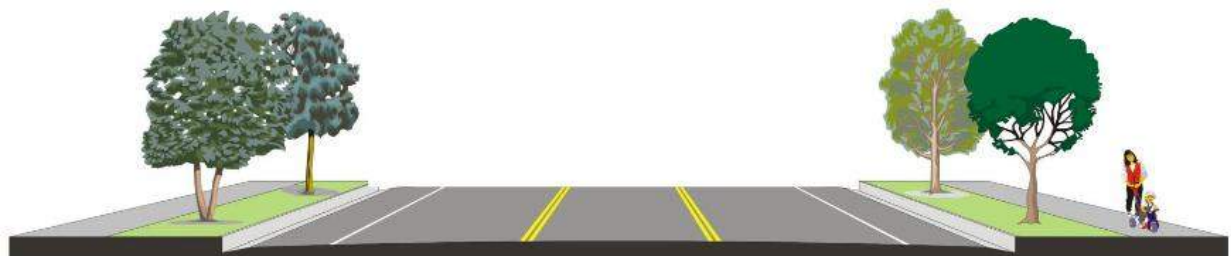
Typical Cross-Sections – Collectors & Local Roads
